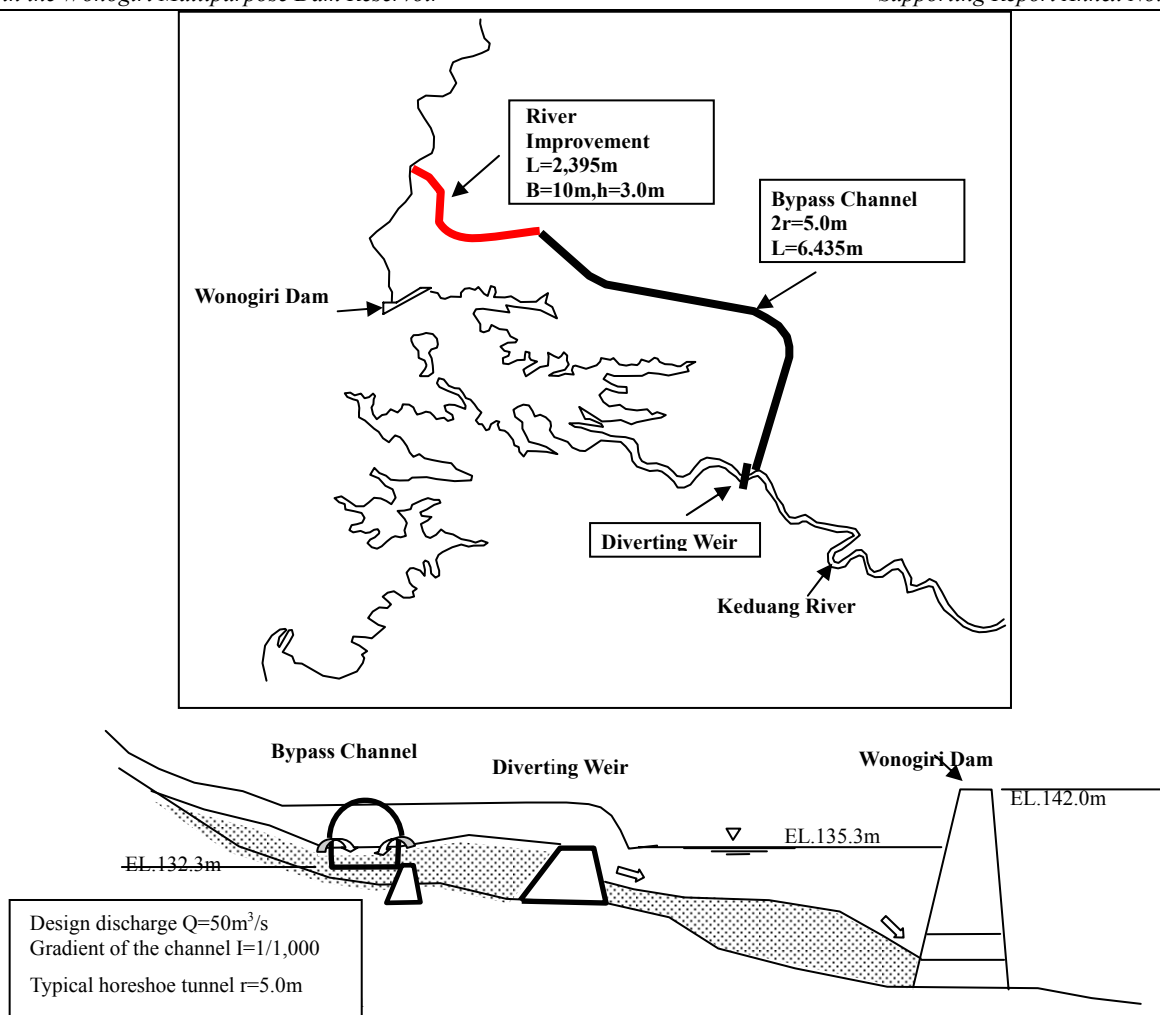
Illustrates of Layout and Alignment of Bypass Channel
